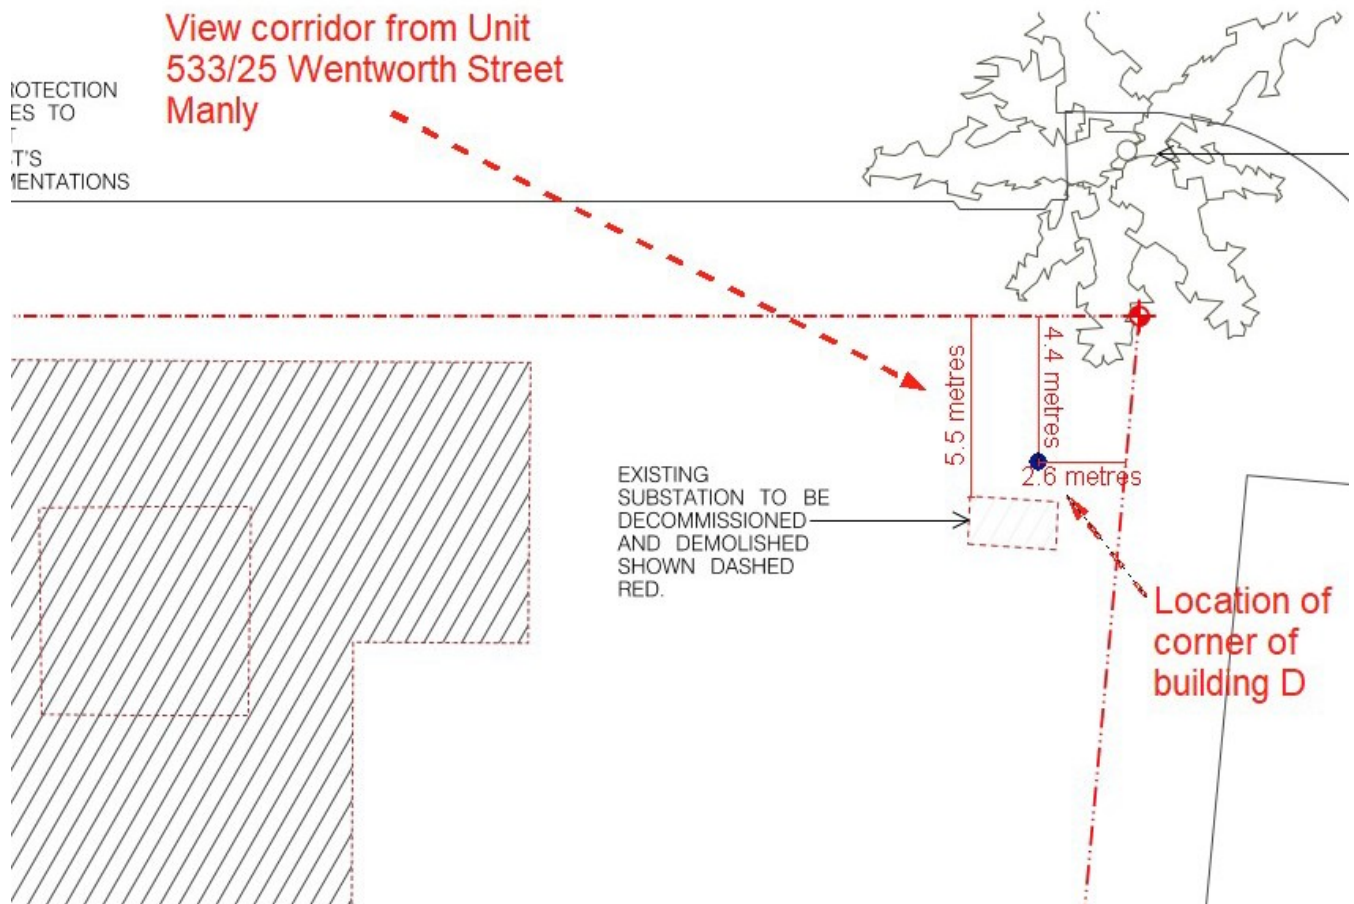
Marked up plan showing building location relative to the substation, based on the proposed setbacks. Mark ups prepared by the assessing officer.
